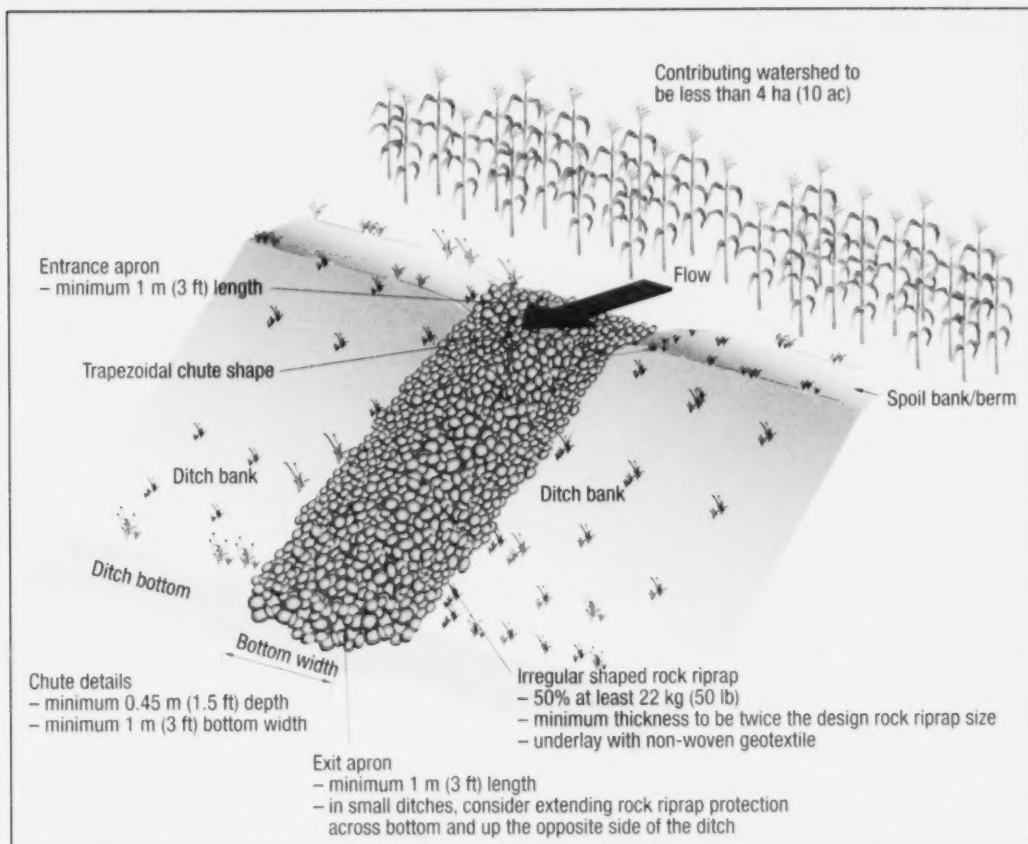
Ditch Bank Protection Using a Small Rock Chute Spillway
